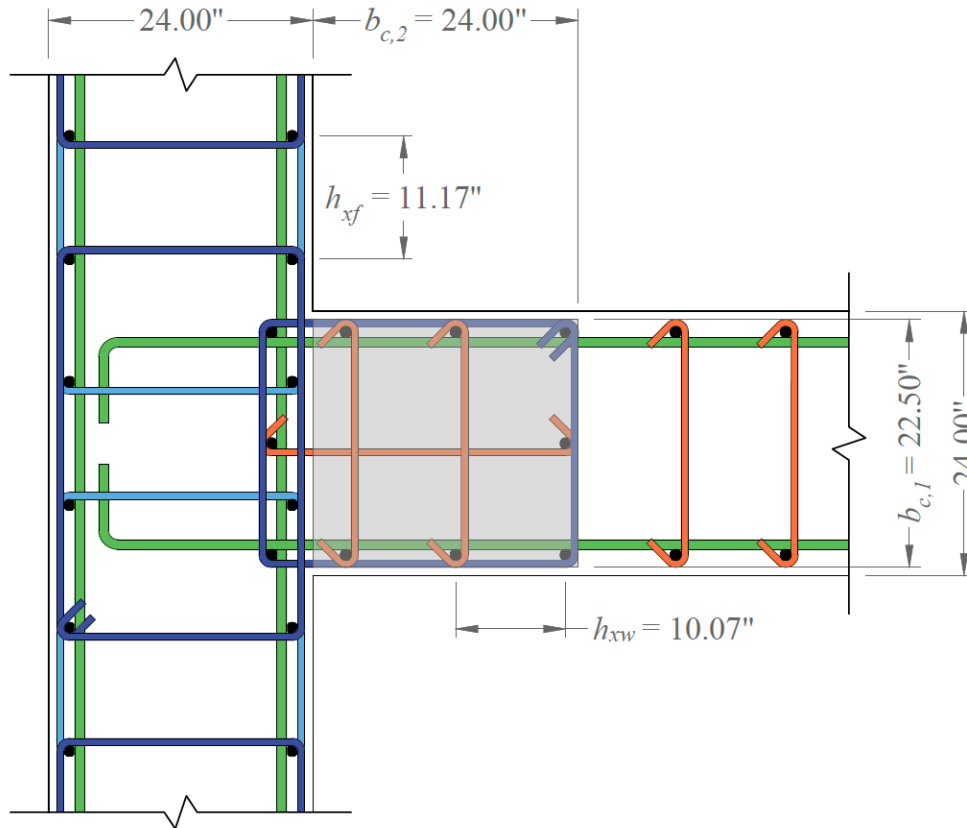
Special boundary transverse reinforcement in the web of the wall
